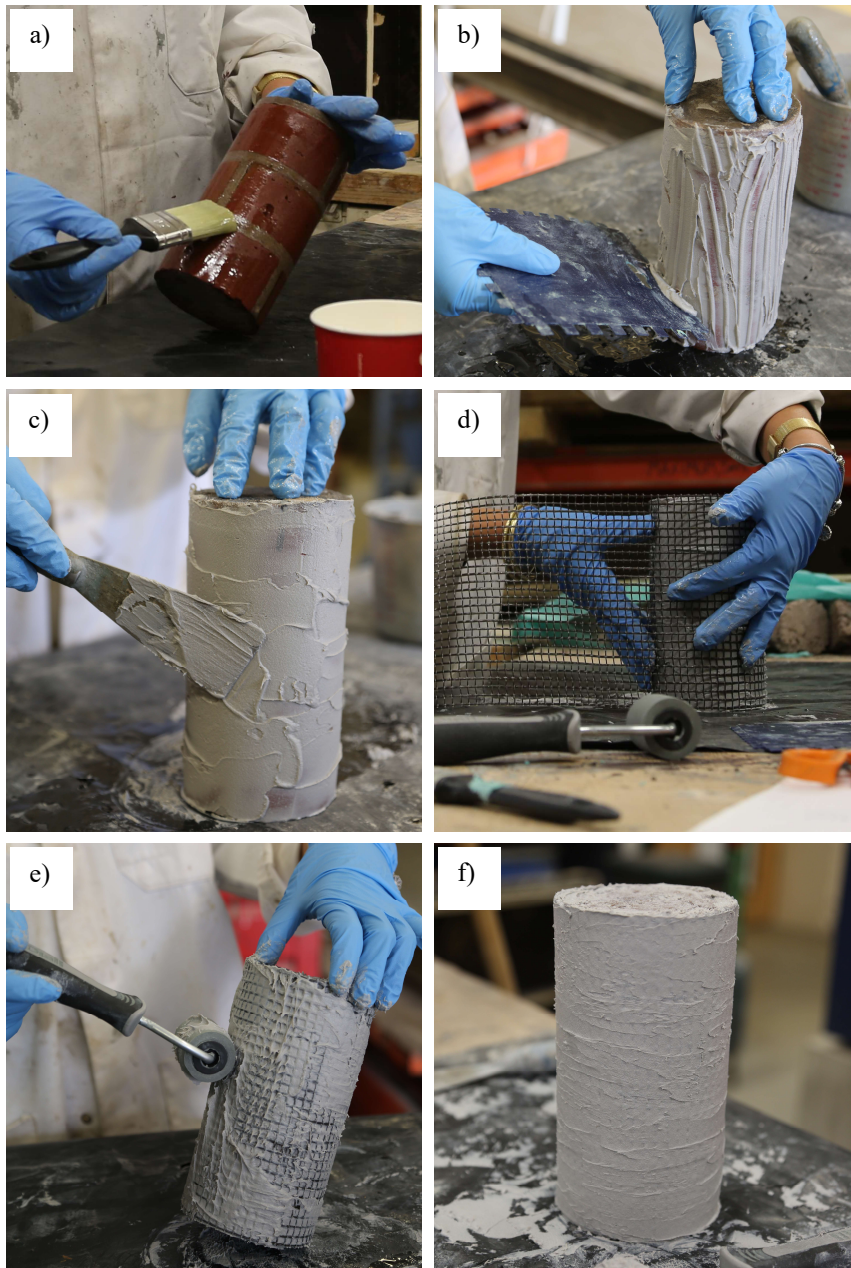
Preparation of BFRP-reinforced masonry specimens: a) application of primer; b) c) application of first coat of resin; d) installation of basalt grid; e) application of second coat of resin; f) specimen after wrapping
